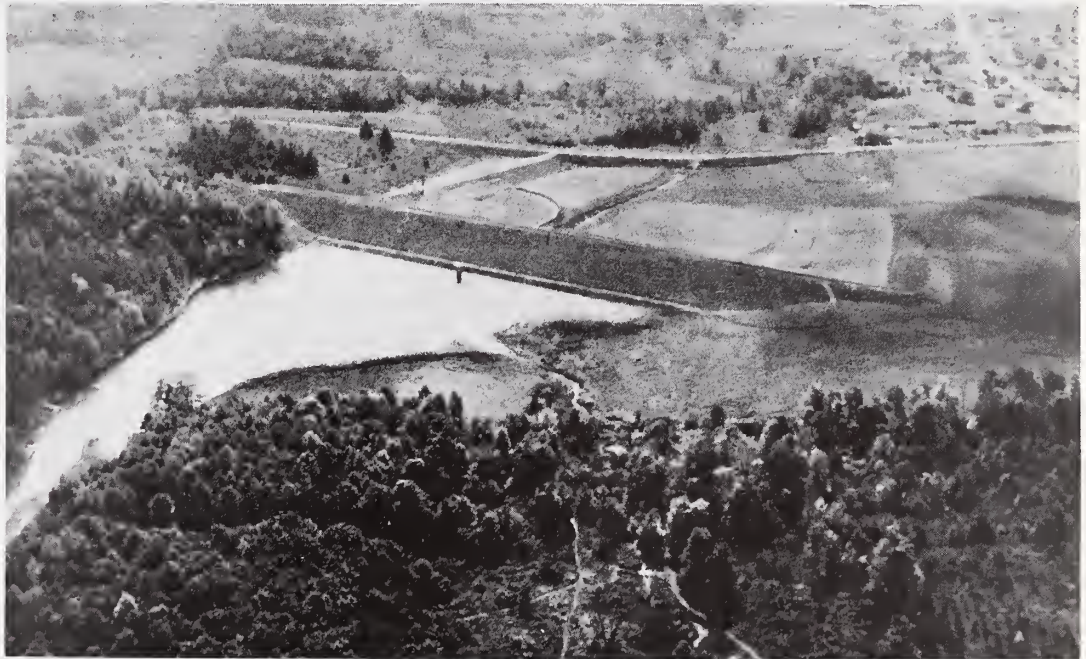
TYPICAL FLOODWATER RETARDING STRUCTURE
